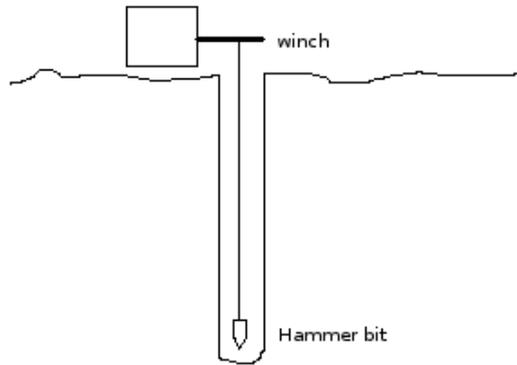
Cable tool drilling. The cable tool has a hammer type bit. This is raised with the winch and then allowed to fall and pulverize the rock. The cuttings are removed in a method similar to in auger drilling.
